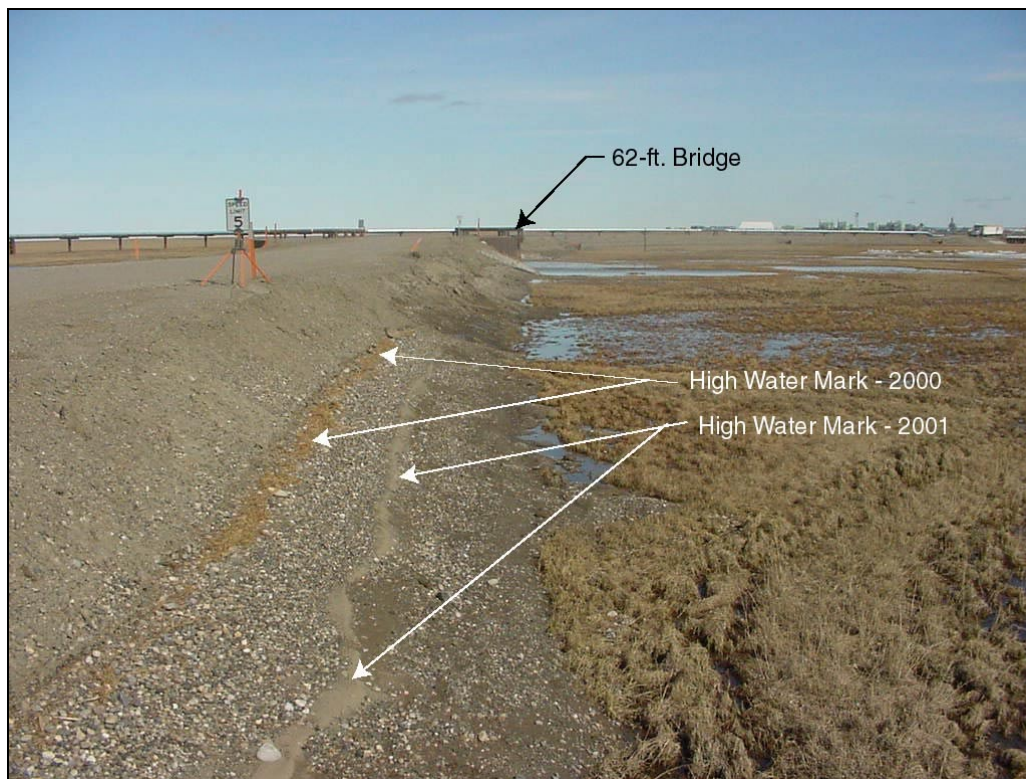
Facing east from Culvert #10 along the north side of the CD-2 access road. Photo taken June 16, 2001.
